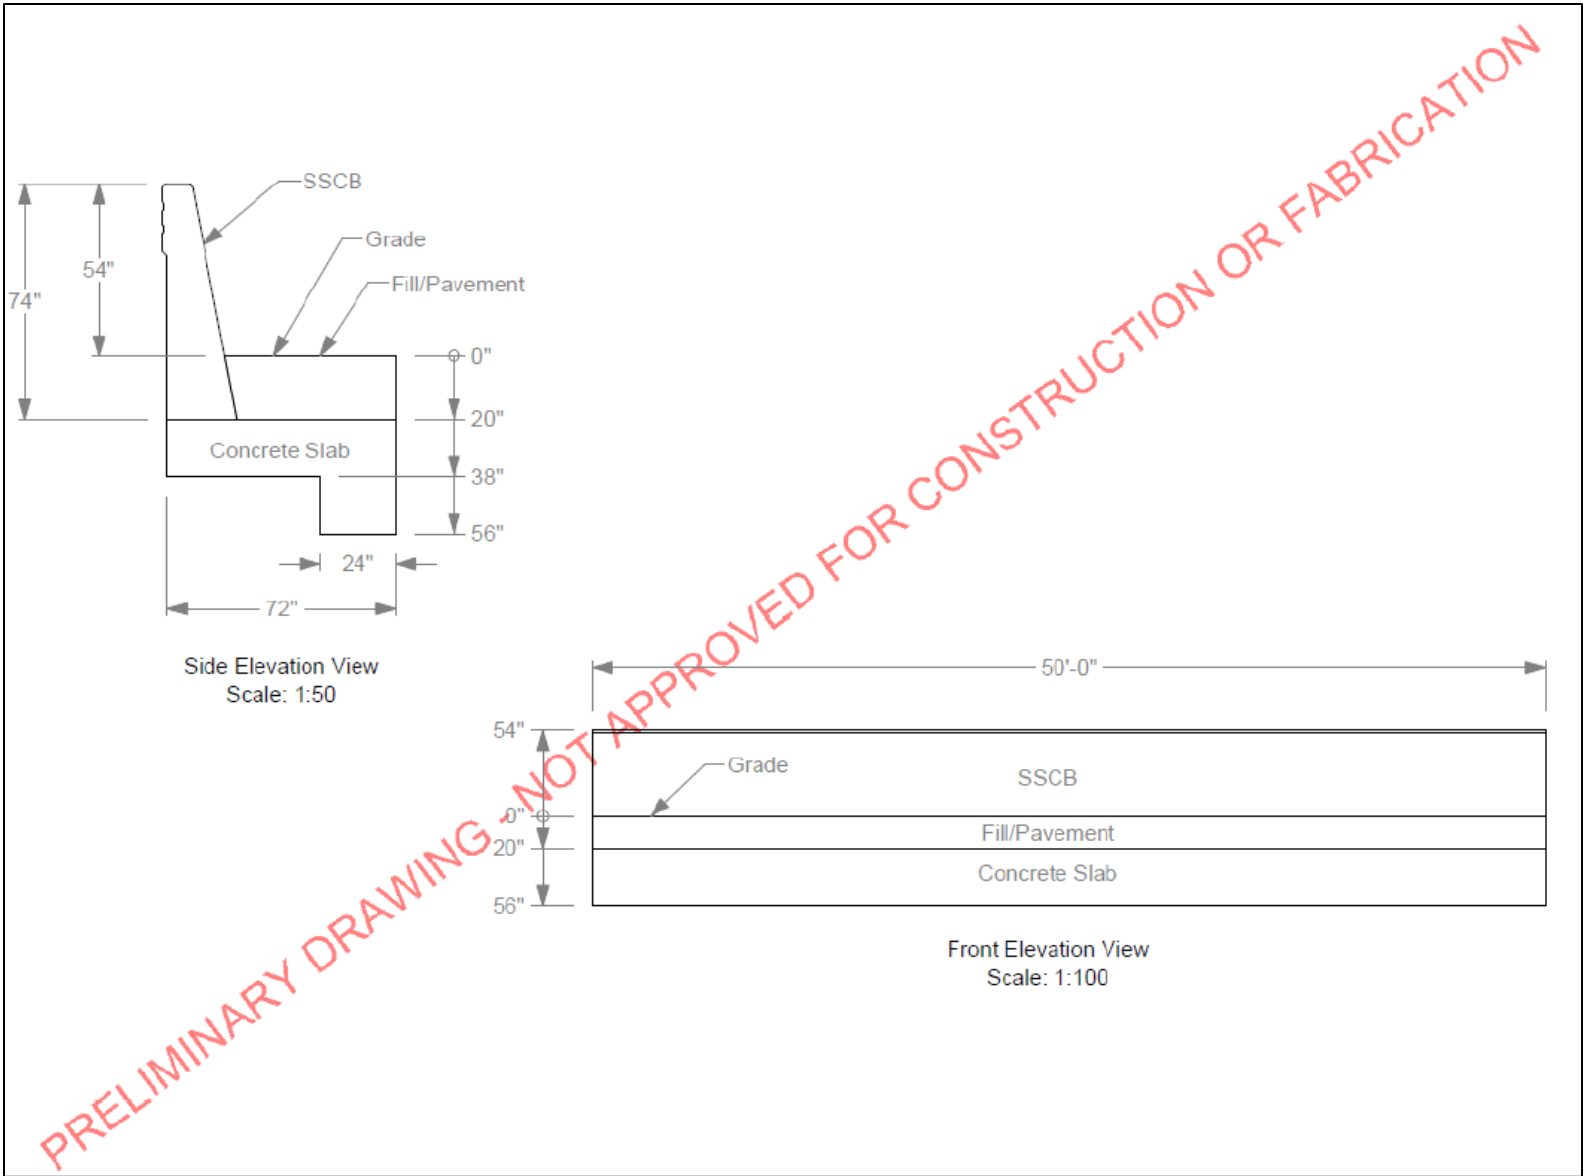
Design Concept 7 – Moment Slab with Concrete Beam and Overlay Design (TTI, 2017)
